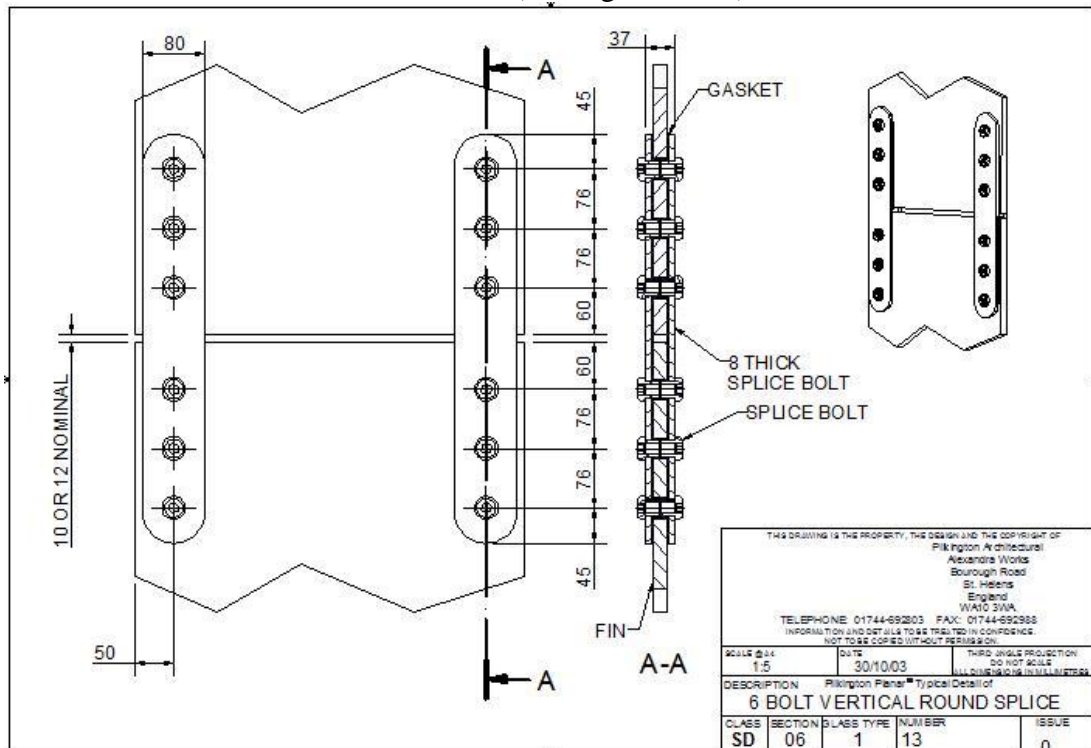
Slice Plate Connector to Glass Fin for Curtain Wall Detail (Pilkington, 2009)
